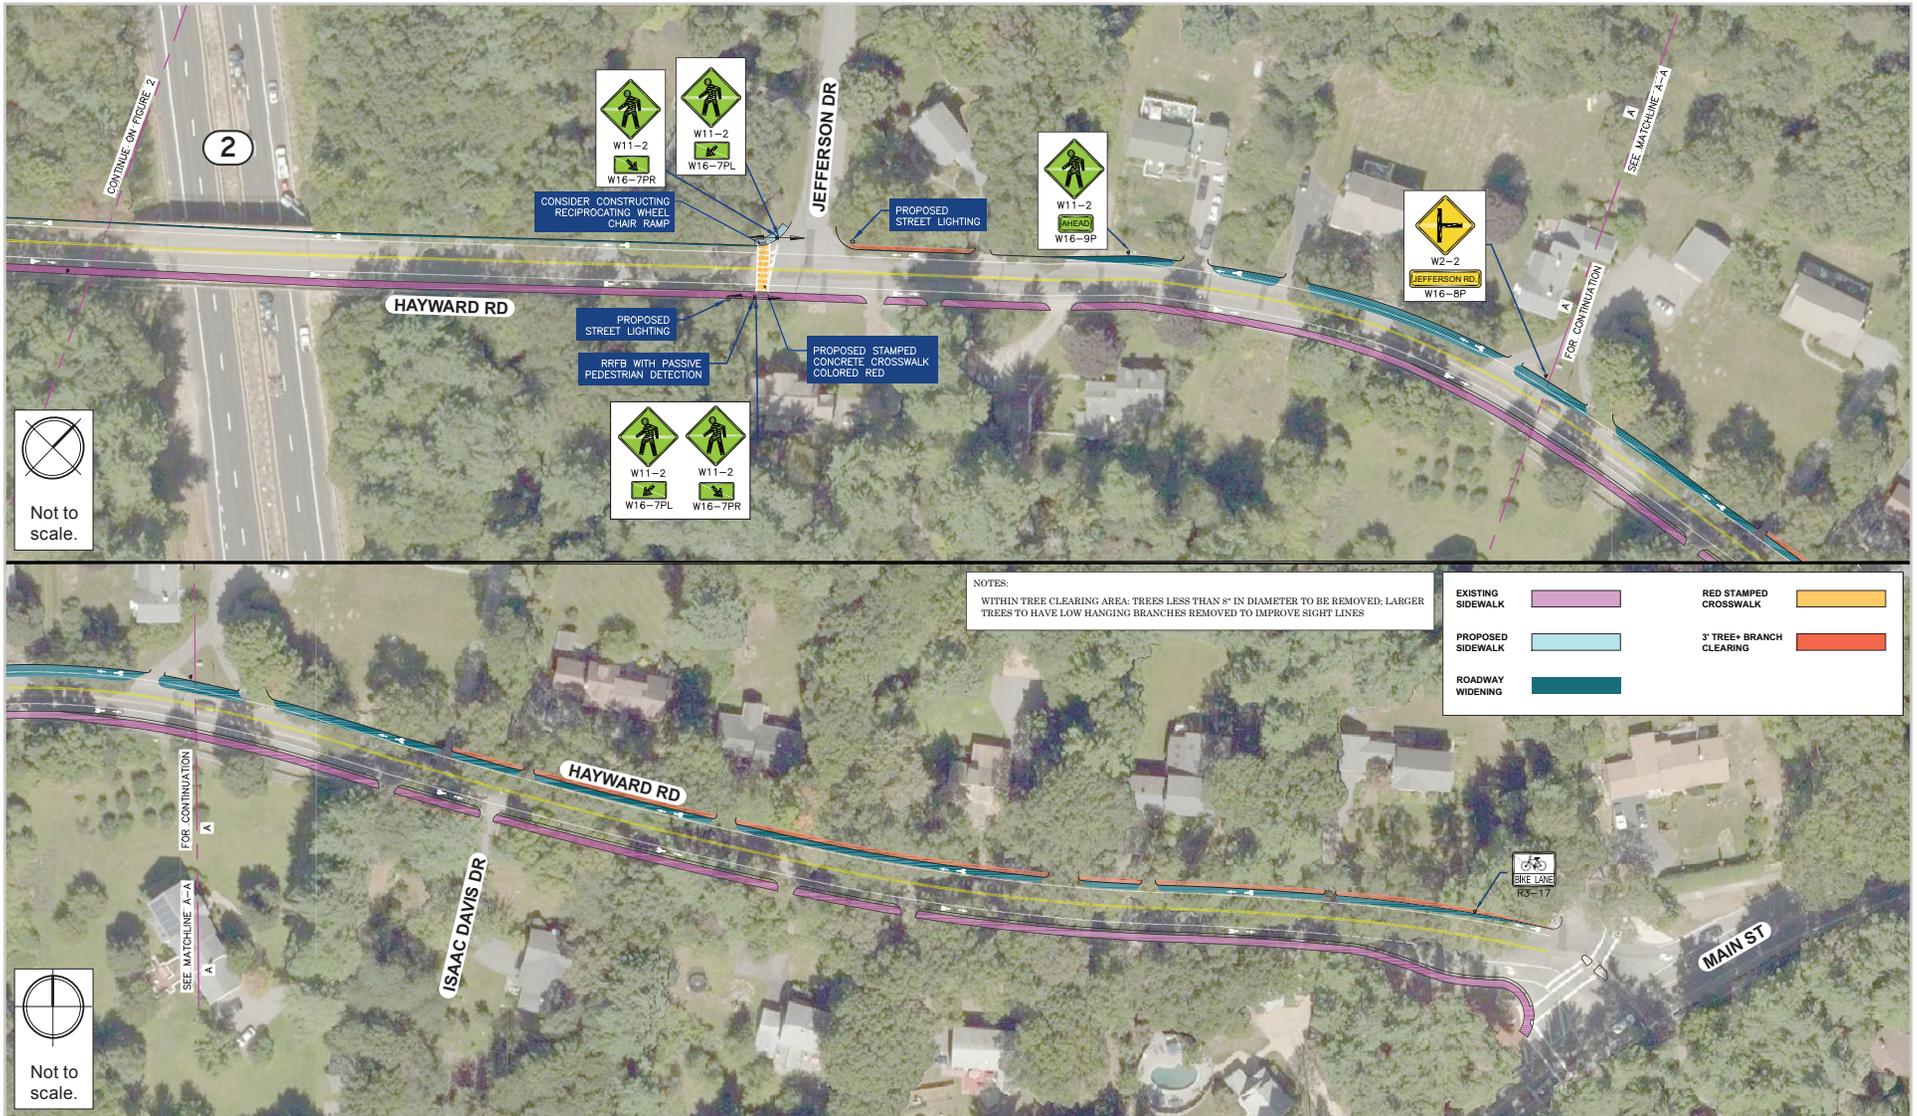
Long-term improvements – Route 2 Bridge to Main Street
